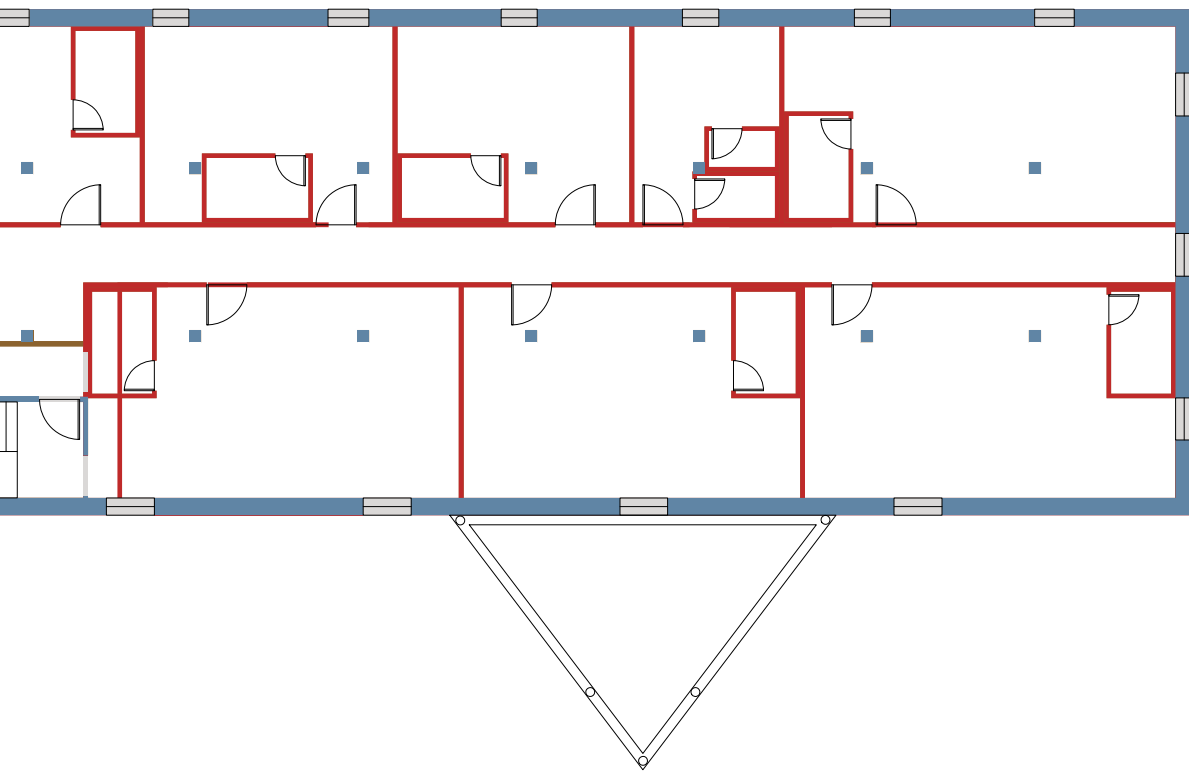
Existing Structure, New Structure, and Removed Structure Diagram of the 2nd Floor
